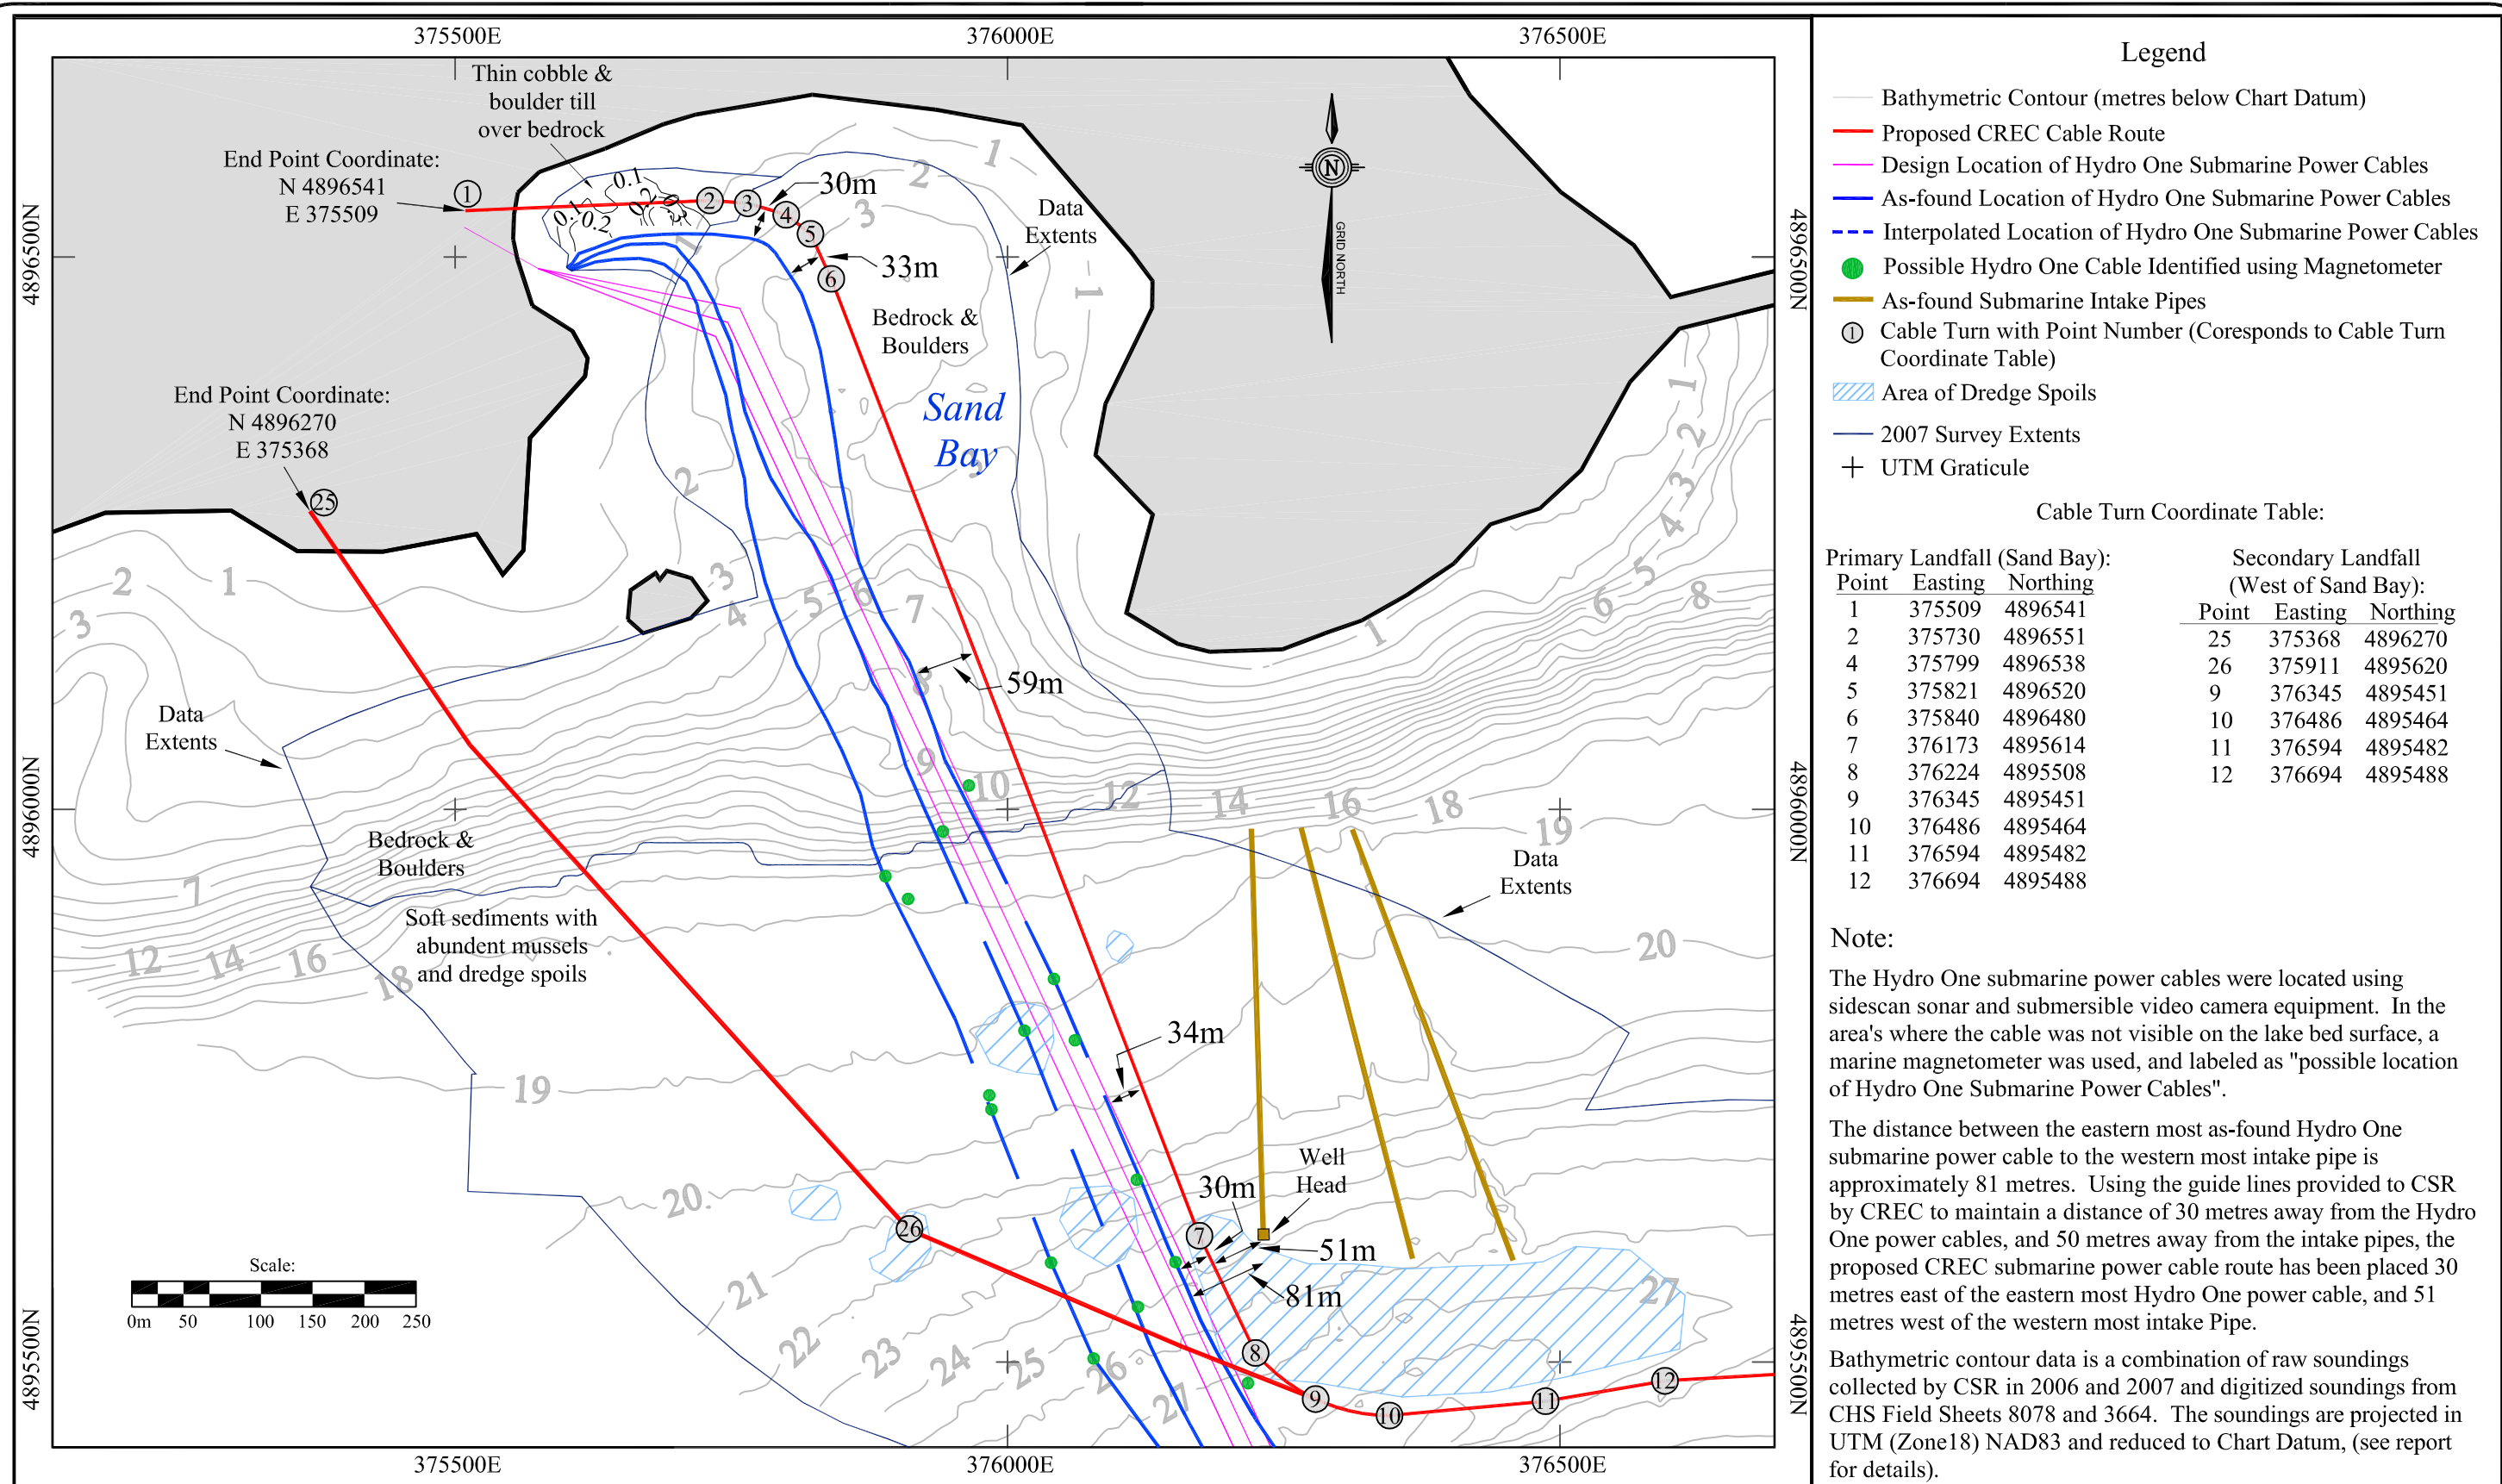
Detailed drawing of the proposed CREC cable route as it passes the intake pipes and Hydro One power cables, and runs into Sand Bay.
